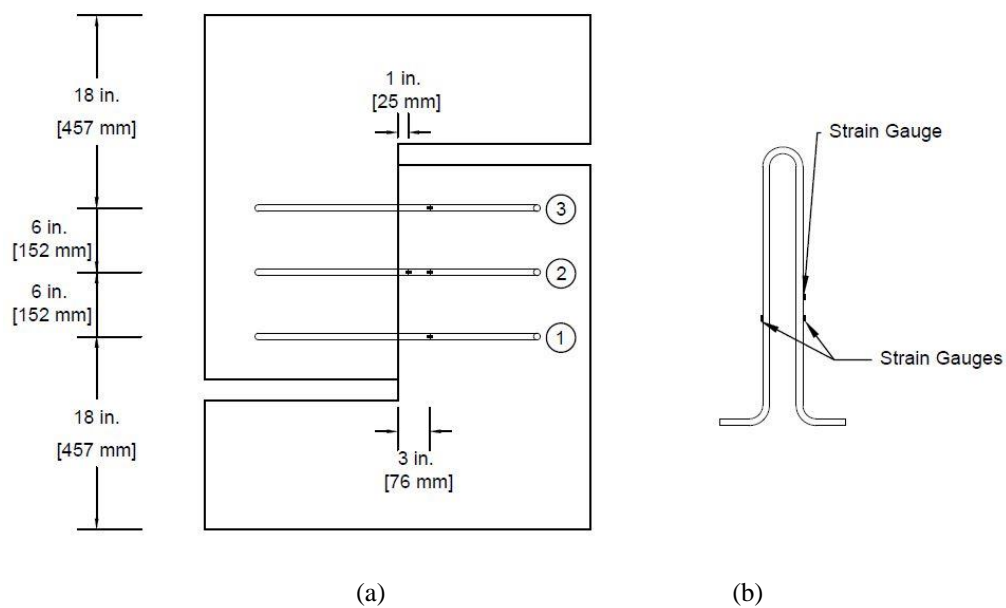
(a) Internal instrumentation elevation for specimens constructed with 3 reinforcing steel U-bars; (b) U-bar
